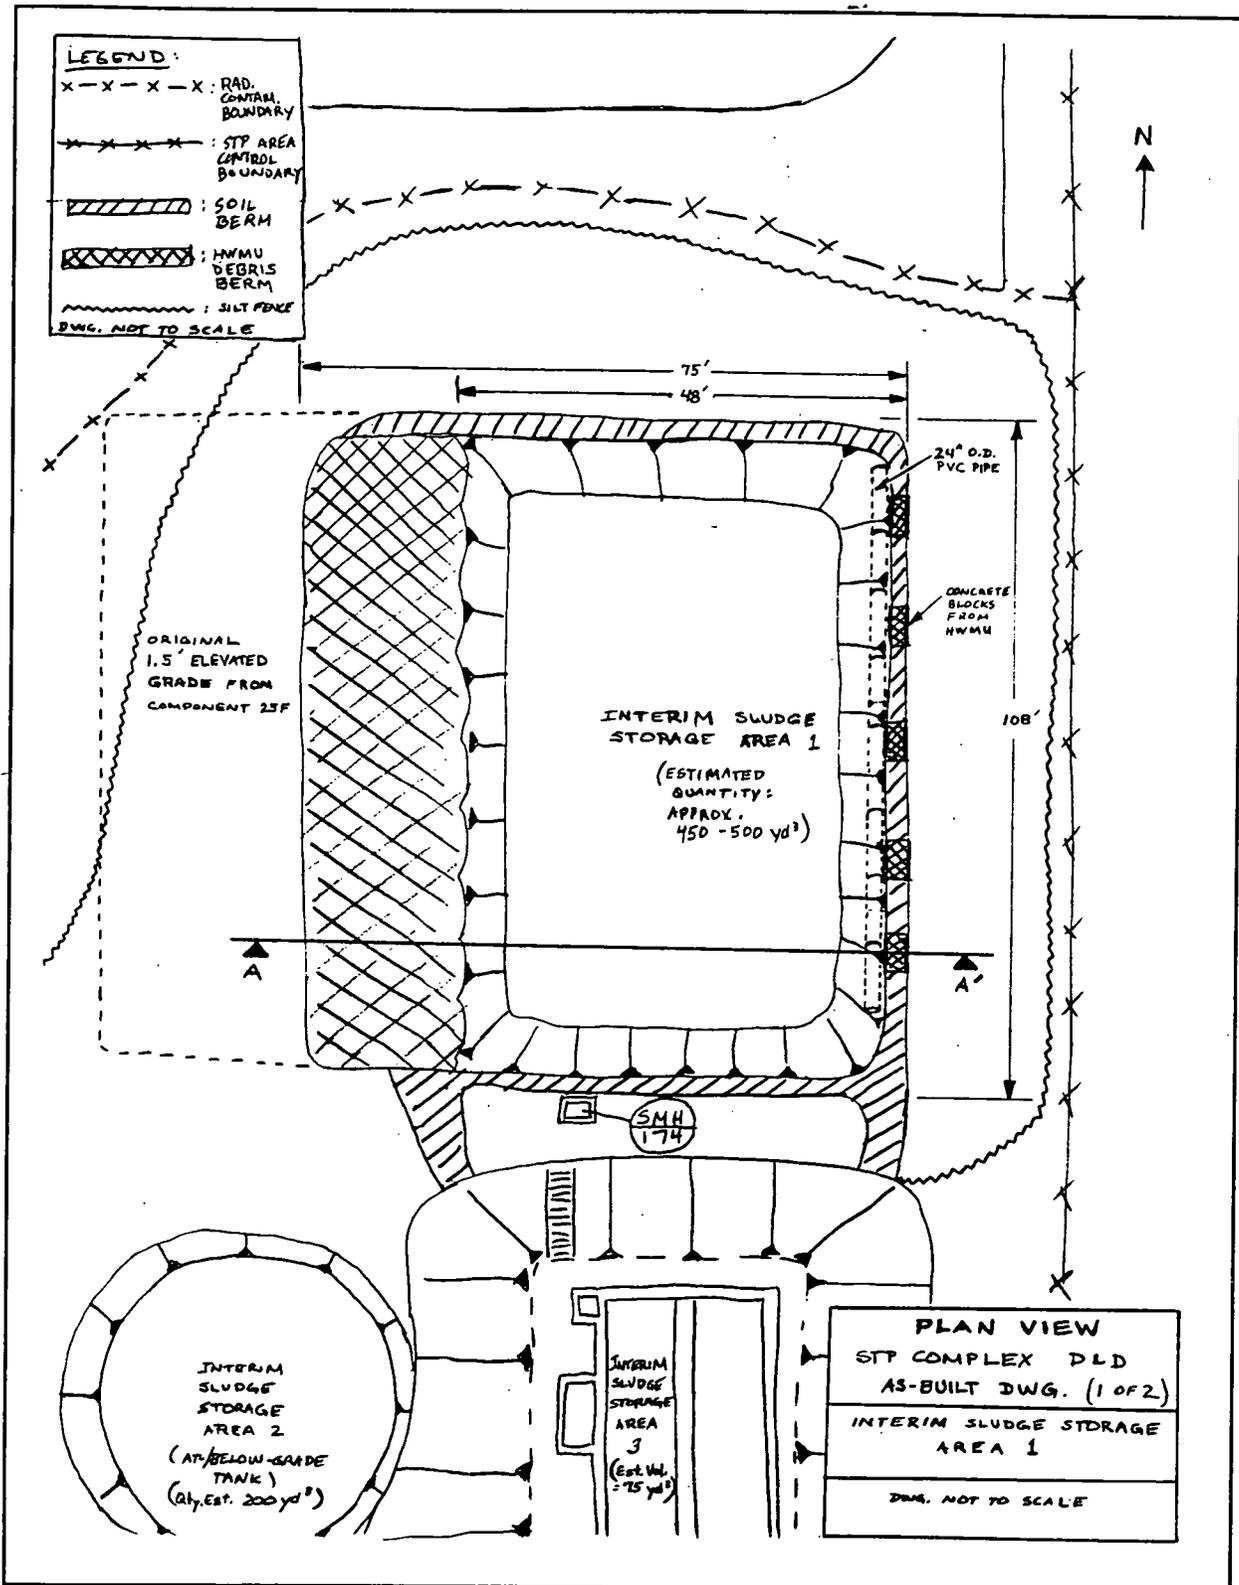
Interim Sludge Storage Area 1 Plan View
